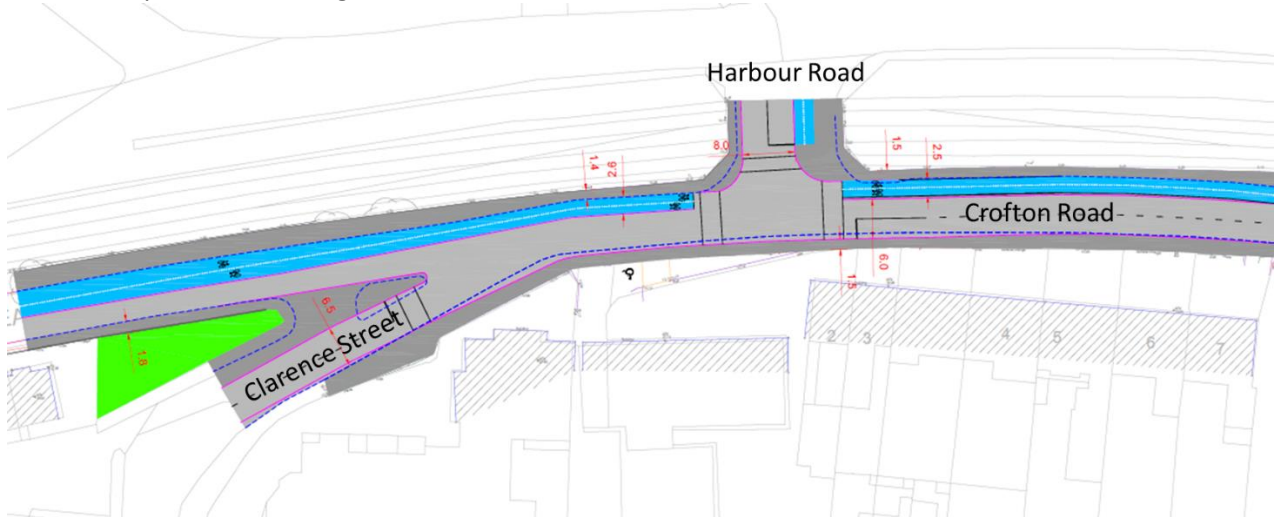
Revised layout of Coal Quay Bridge Junction
